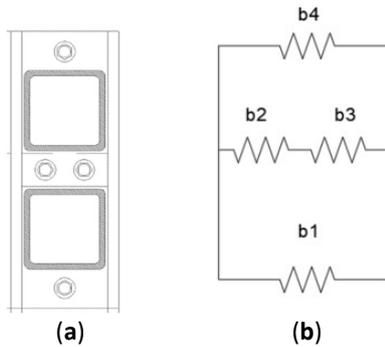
Gunawardena inter-module connection: (a) Top view, (b) Schematization of longitudinal bolt stiffness.
